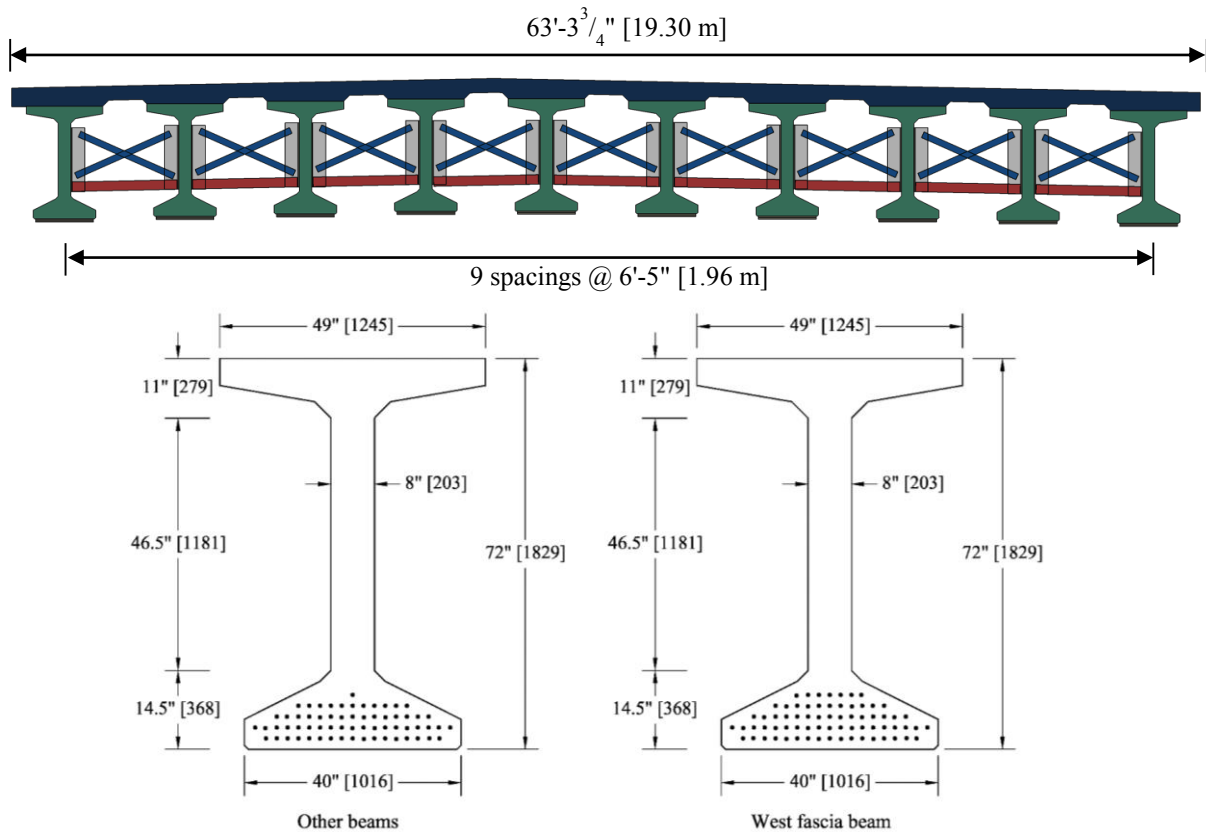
Cross section and distribution of prestressing CFCC strands in bridge beams
